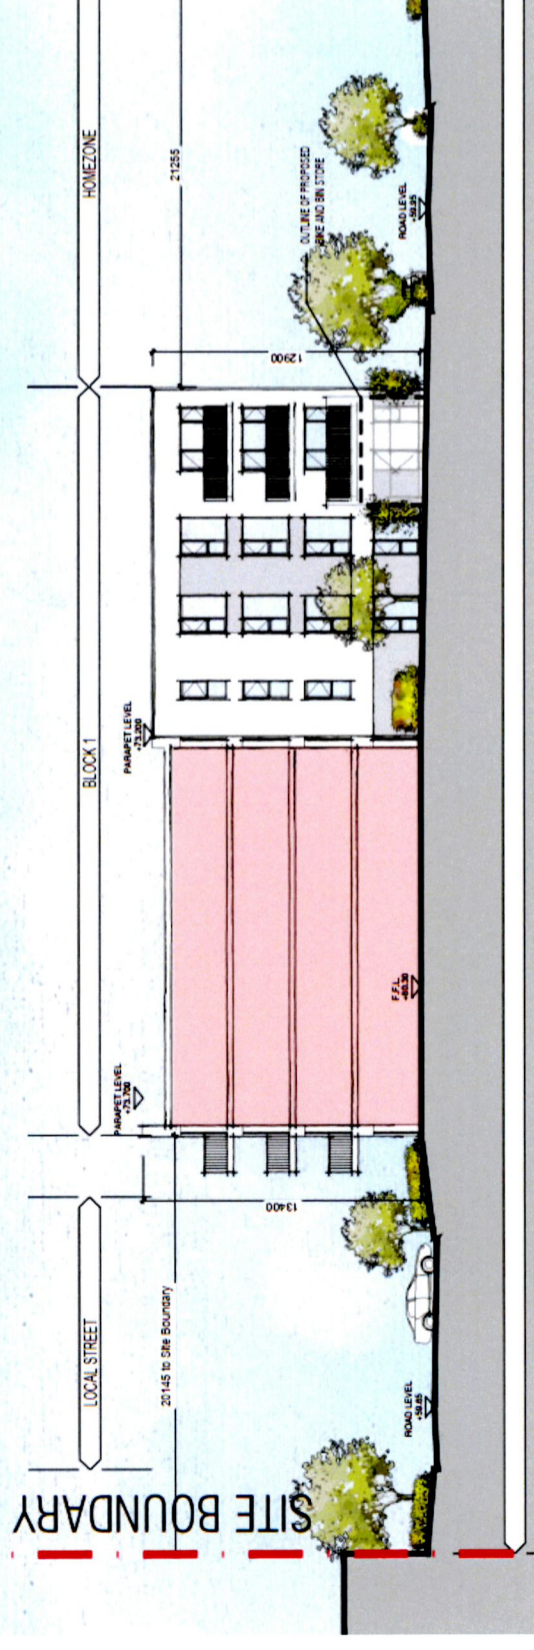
SECTION THROUGH BLOCK 1 AND BRIDGE
